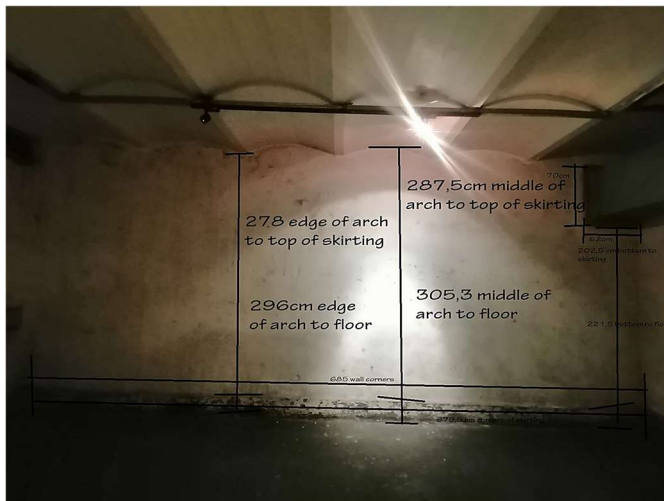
In-situ digital photograph notes of the West wall measurements. Photograph by author.
